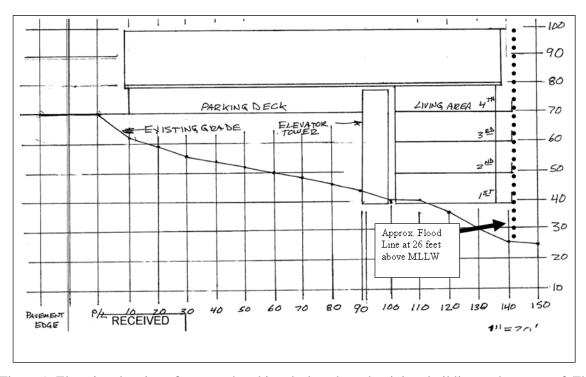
Elevation drawing of proposed parking deck and condominium building under one roof. Flood hazard line of 26 feet is indicated at its vertical axis by the dotted line. The front property line is labeled 'P/L' in the lower left hand corner.
